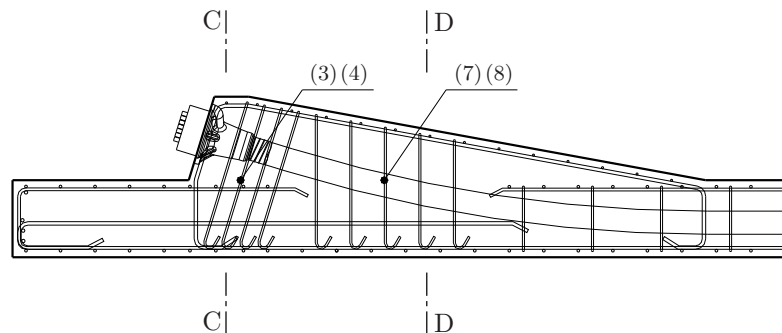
Strain gauges on the anchorage blister reinforcement (Section B-B)
